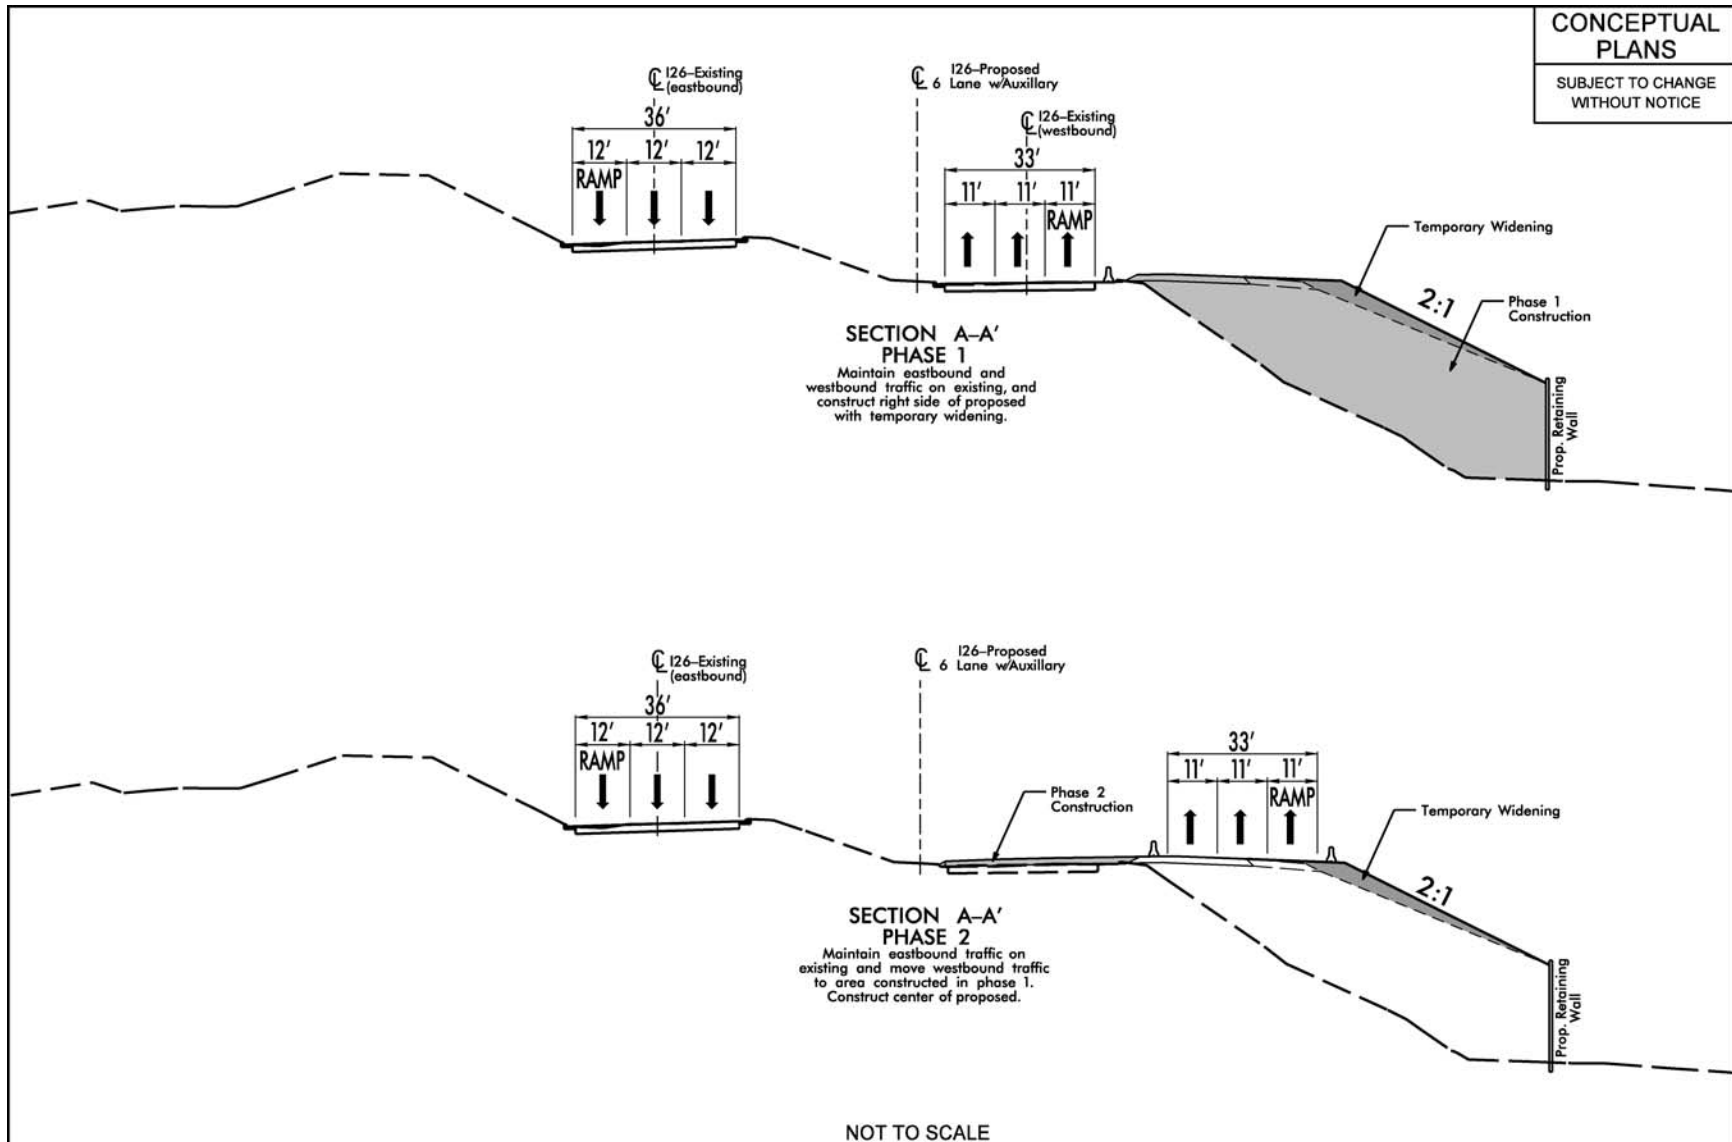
Phase Construction Concepts – Between Brevard Road and Amboy Road
